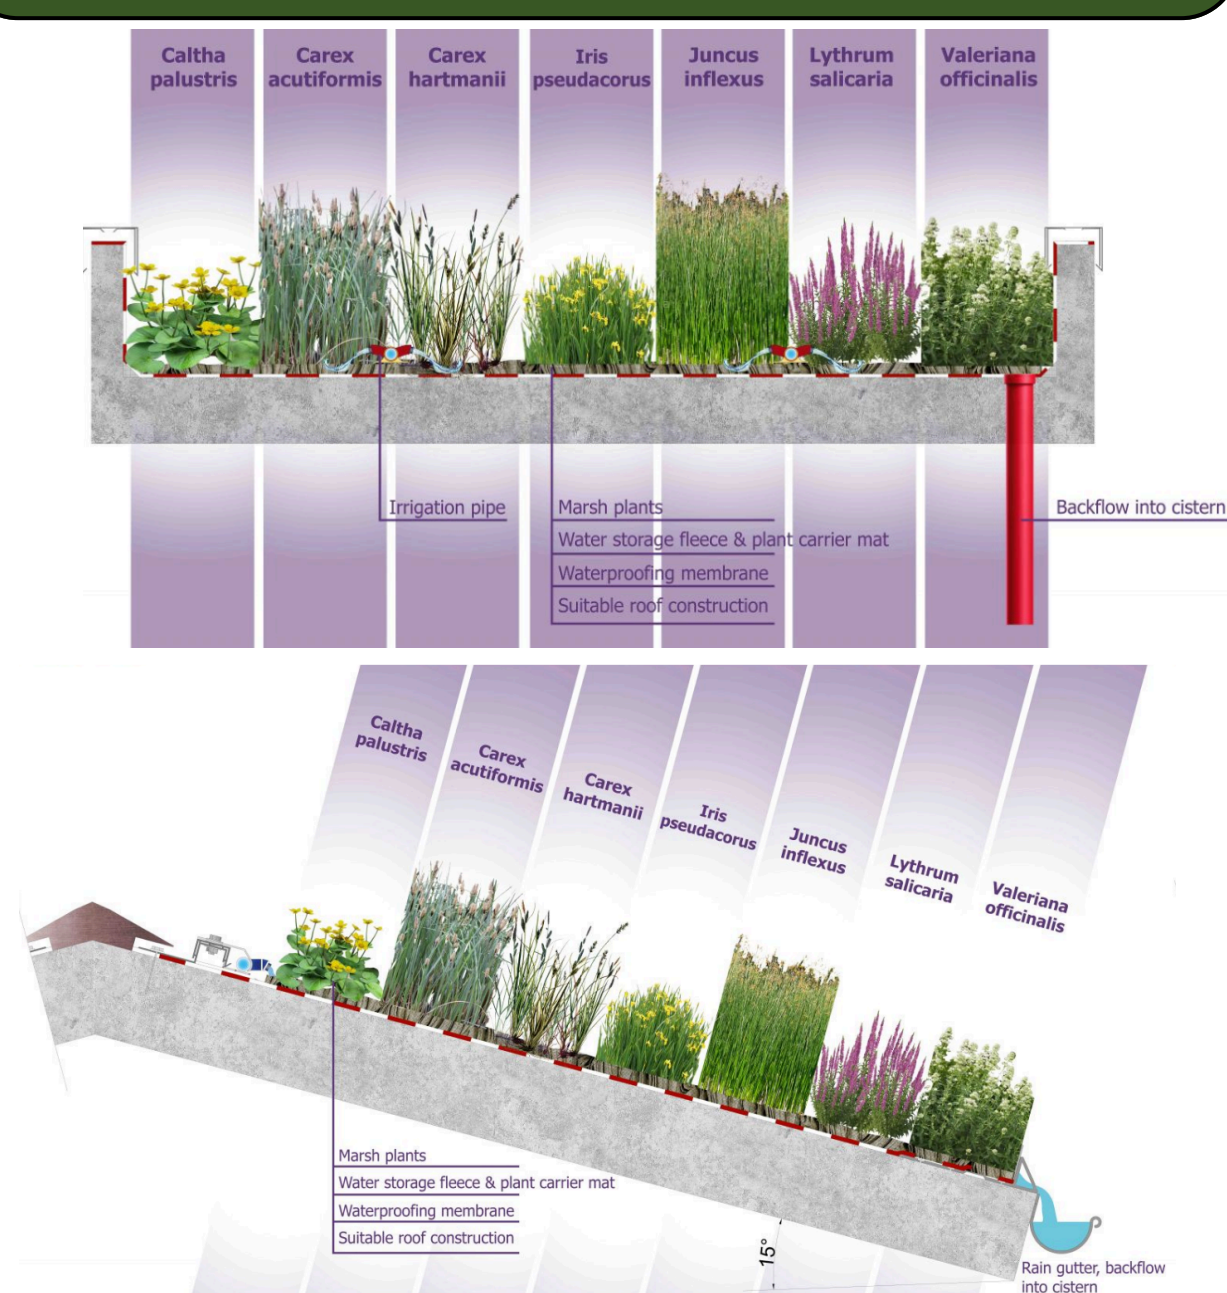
Diagrams of typical wetland roofs with roof slope 0° and 15° (<https://rhizotech.de/en/131/wetland-roof>)
